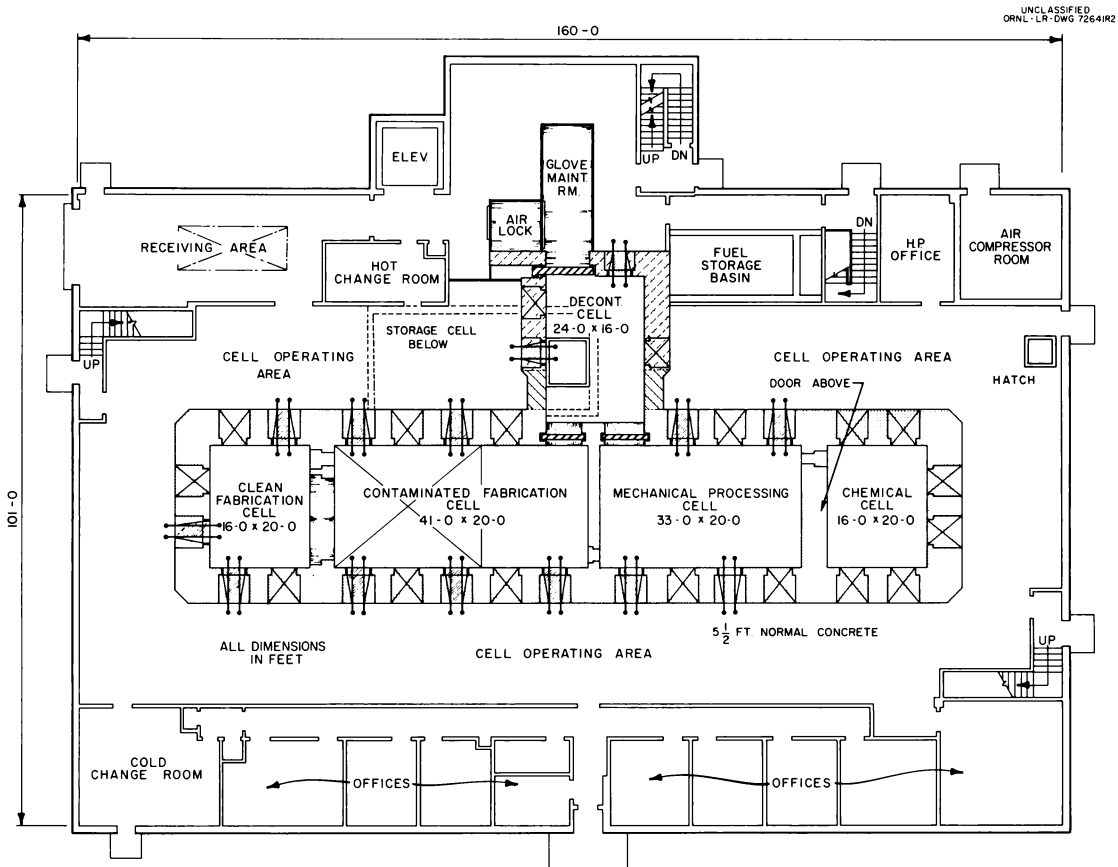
First-Floor Plan of Thorium-Uranium Fuel-Cycle Development Facility.
